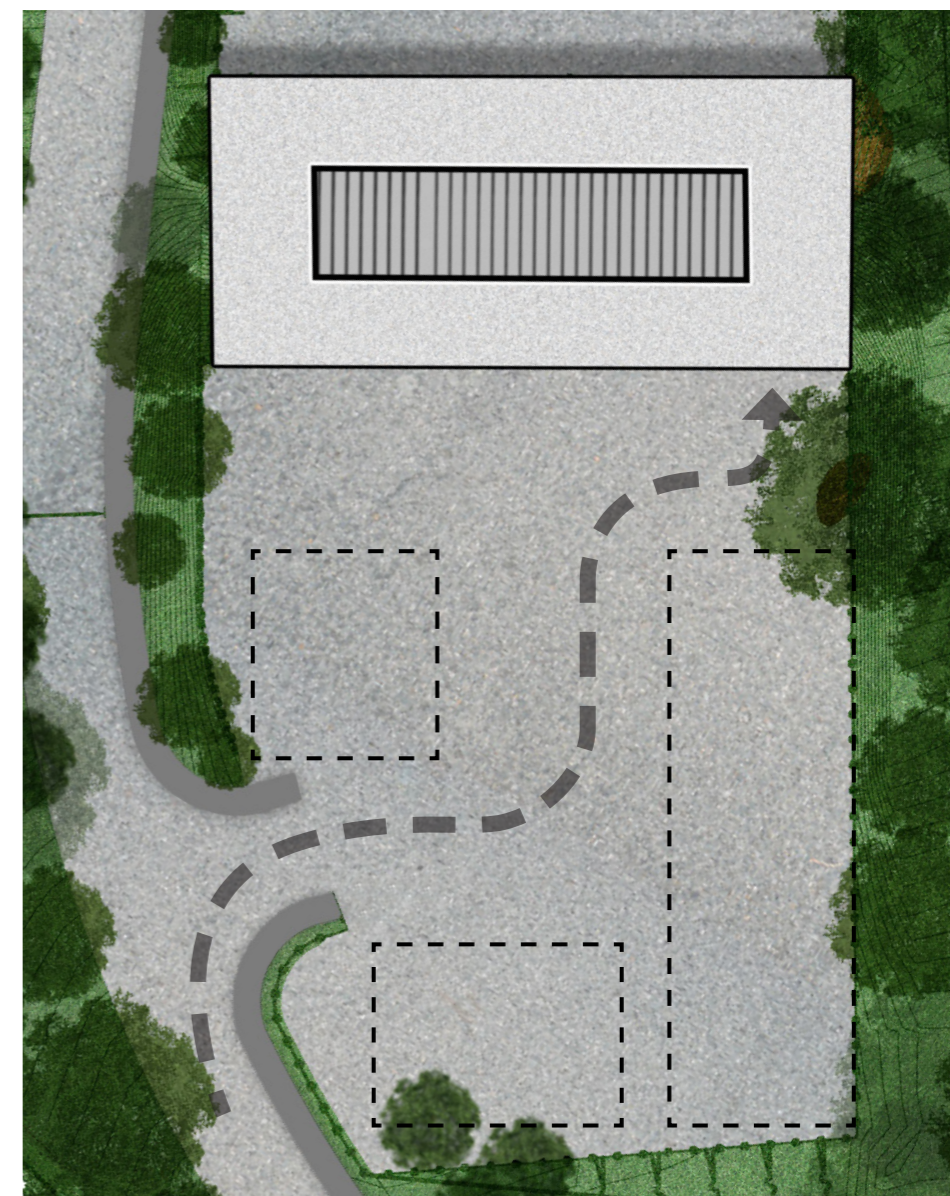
Typical yard arrangement showing proposed storage zones & vehicle access route
